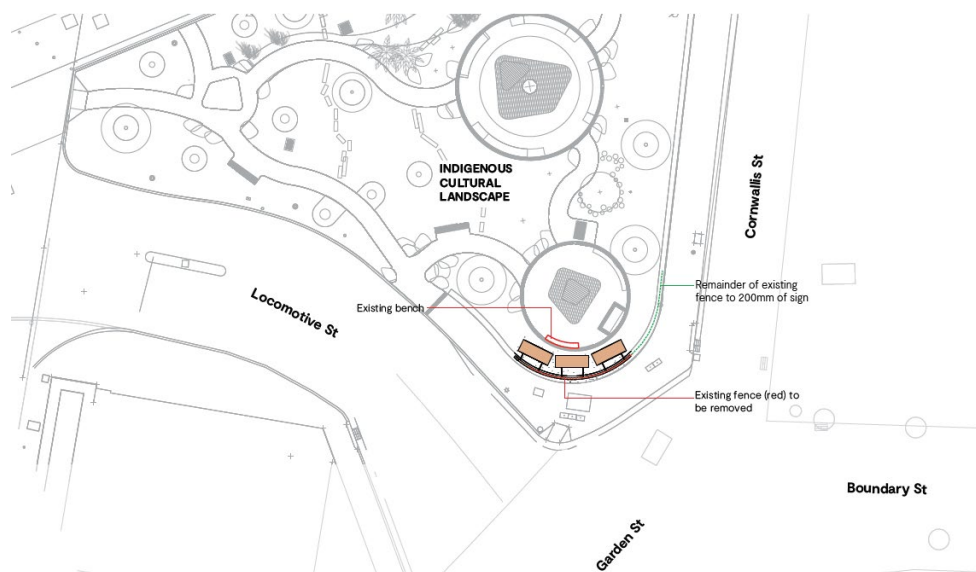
Site Plan for 'Locomotive Street' signage (Source: Mirvac, Diadem and Buchan, 2020)
